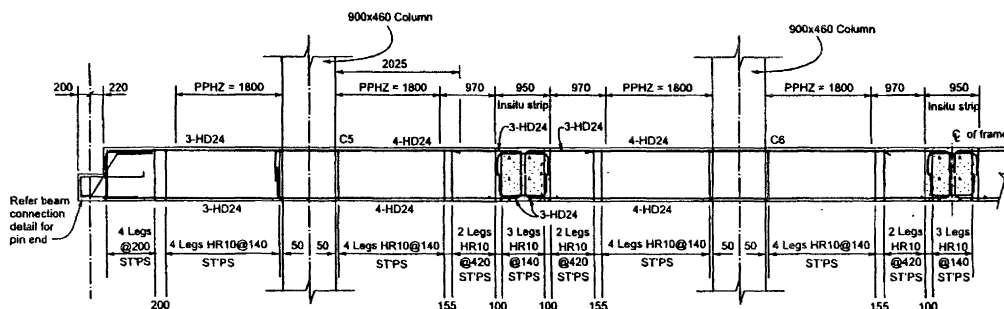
Level Two Reinforcement Layout (CCANZ 1998).
